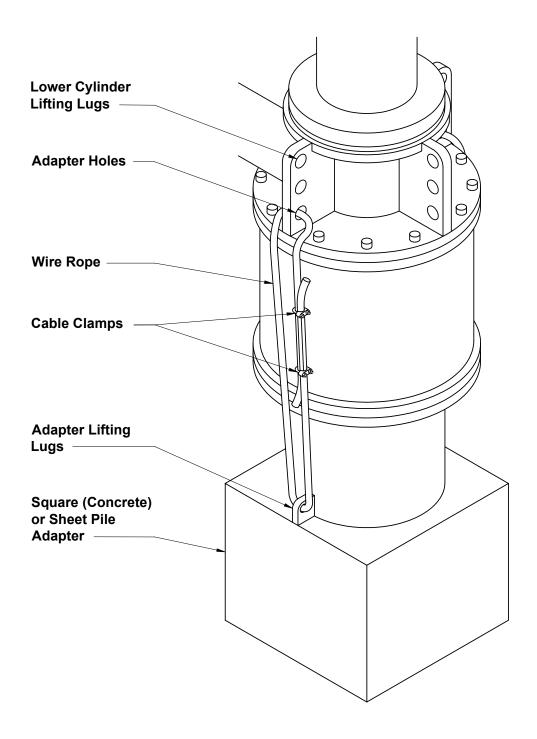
18-Inch Square (Concrete) and Sheet Pile Adapter Installation
